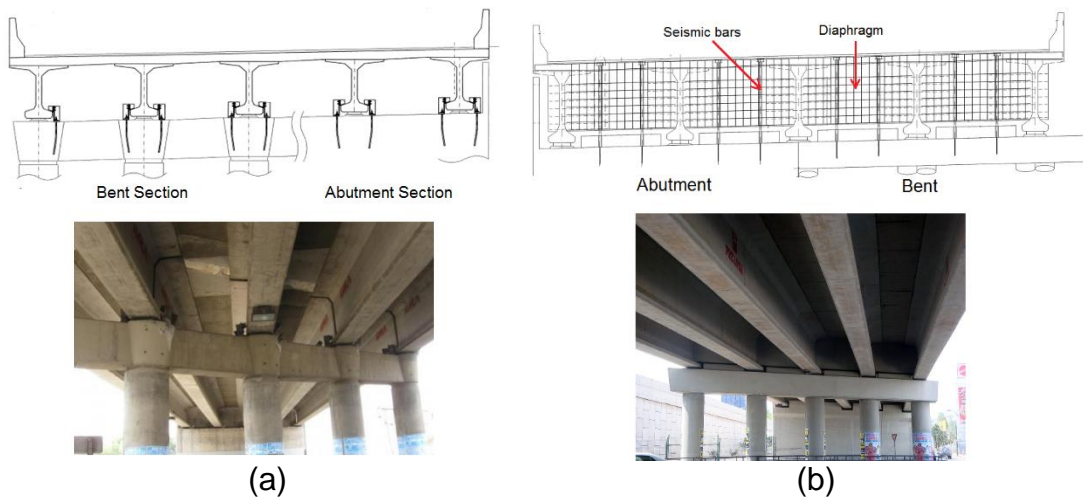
Lo Echevers overpass (a) original bridge, (b) repaired/retrofitted bridge
